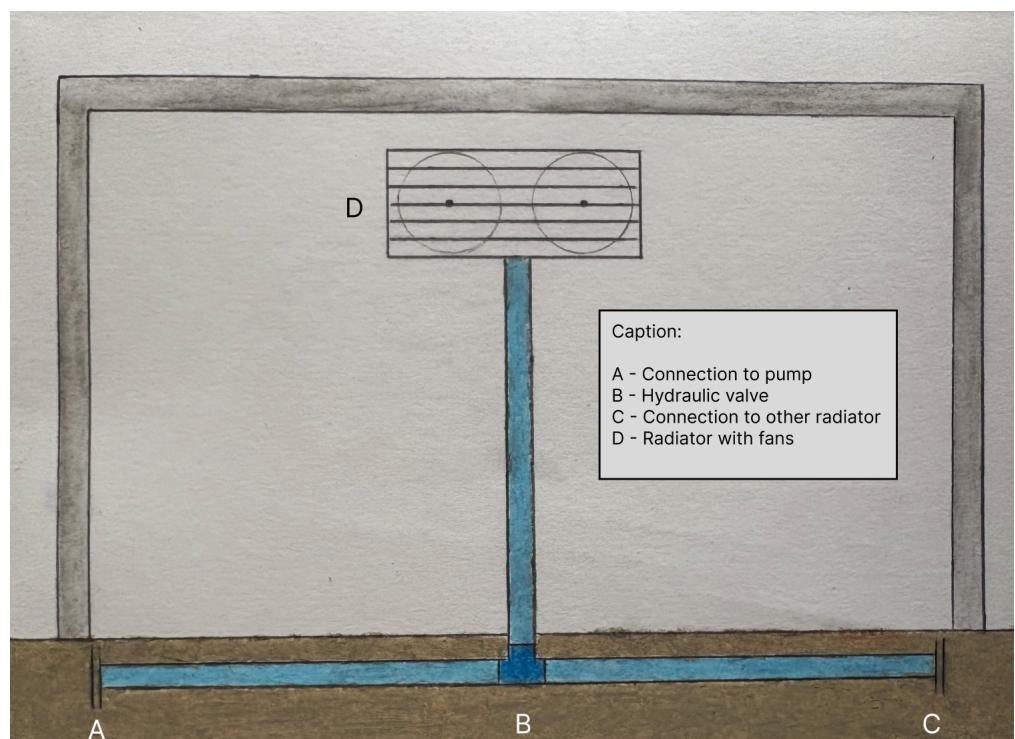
Scheme of construction of an indoor radiator - ex. greenhouse
